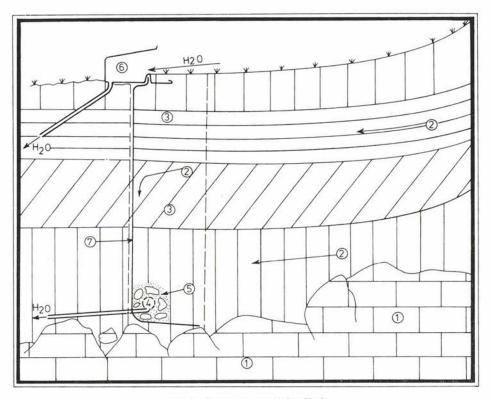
Cross section of the ditch 1. Limestone 2. Infiltrating water 3. Deposit filled back 4. Drain pipe 5. Ballast 6. Pipe duct 7. PVCcover
